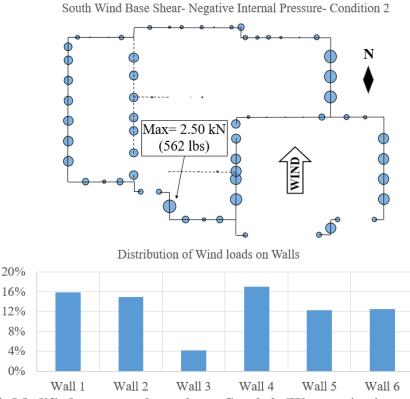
Modified structure base shear. South 0.6W, negative internal pressure, condition 2.
